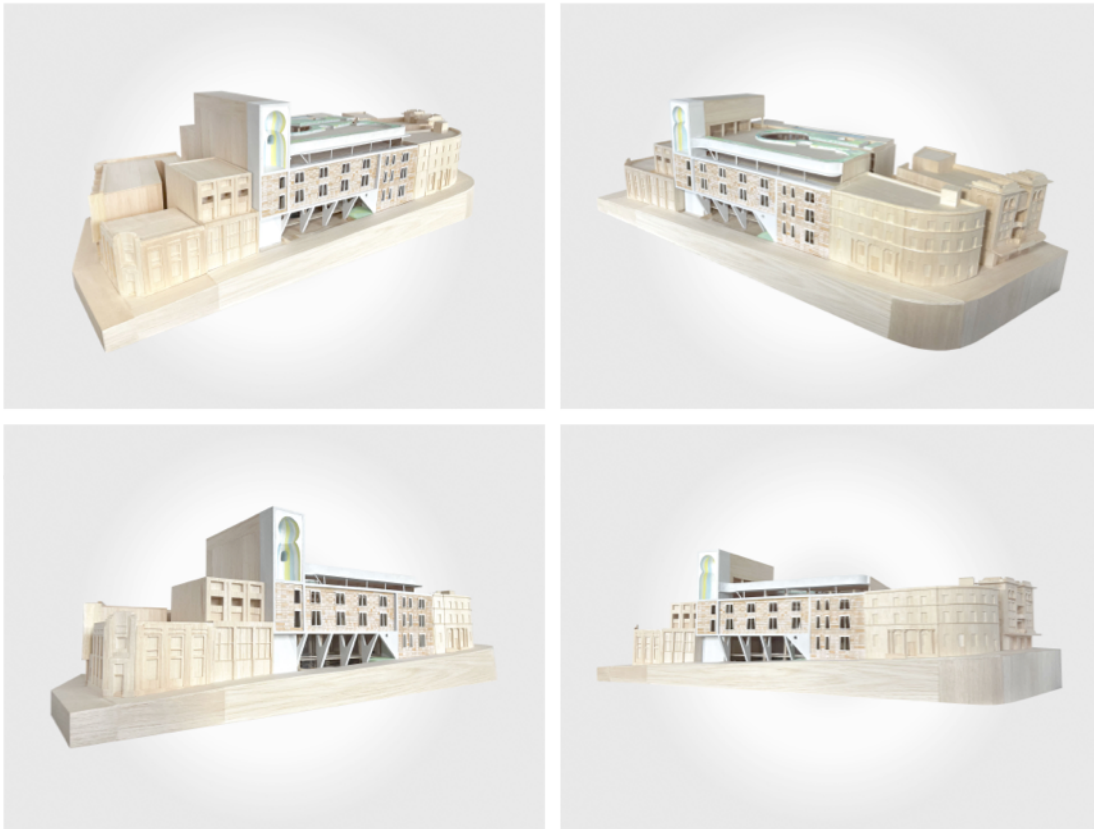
Proposed development model with surrounds showing infilling of built form along Broadway above height control (Durbach Block Jaggers)
